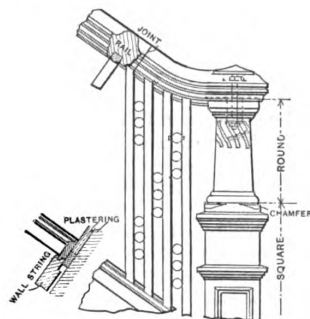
Detail of Main Stair Balustrade and Top of Newel Post.—Scale, $\frac{3}{4}$ Inch to the Foot.
